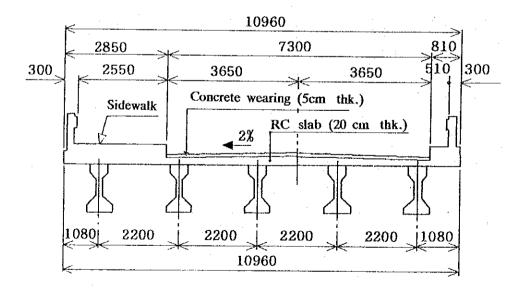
COMPONENTS OF BRIDGE WIDTH (LOWER SILWAY BRIDGE)
